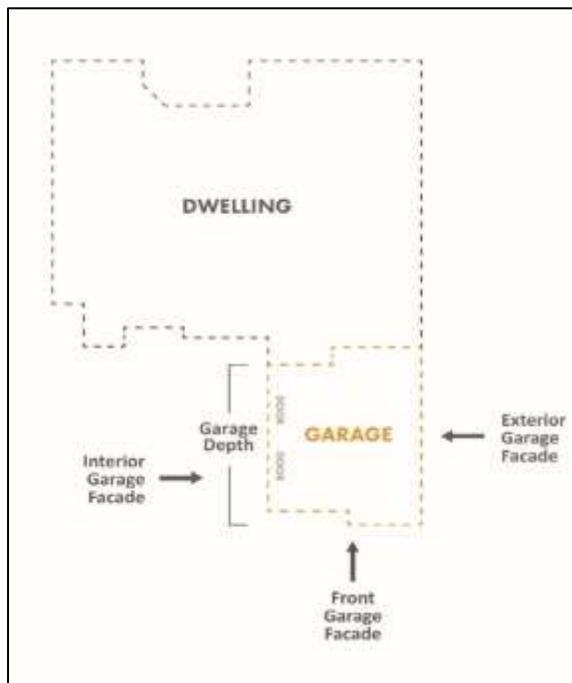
Example of 'L' shaped dwelling with active floor space in front of garage
